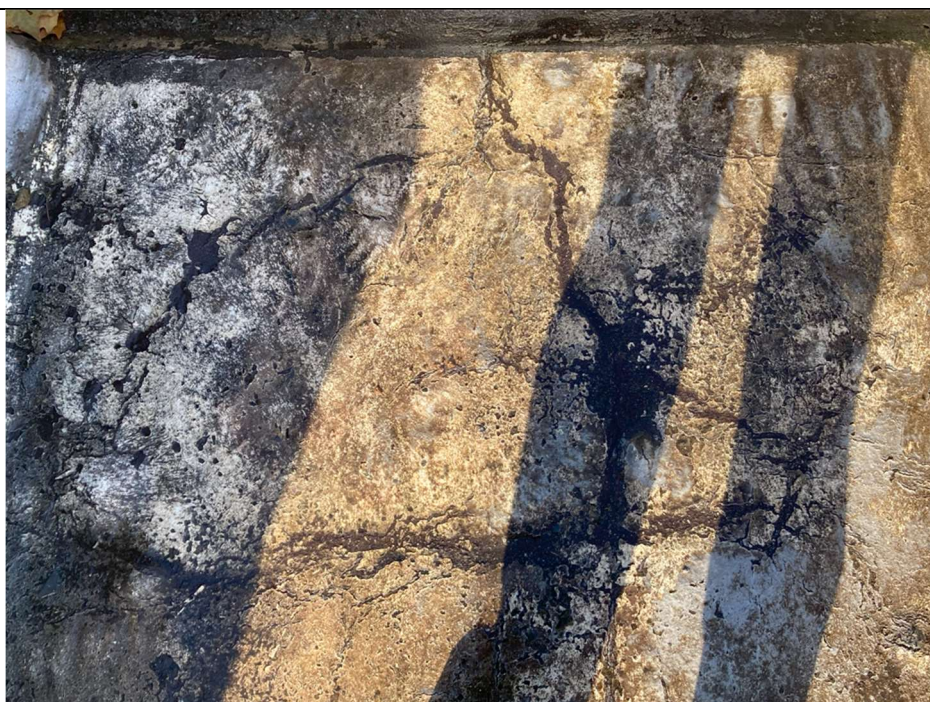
Failed asphalt covering to the central roof area, showing blisters and splitting to this.
